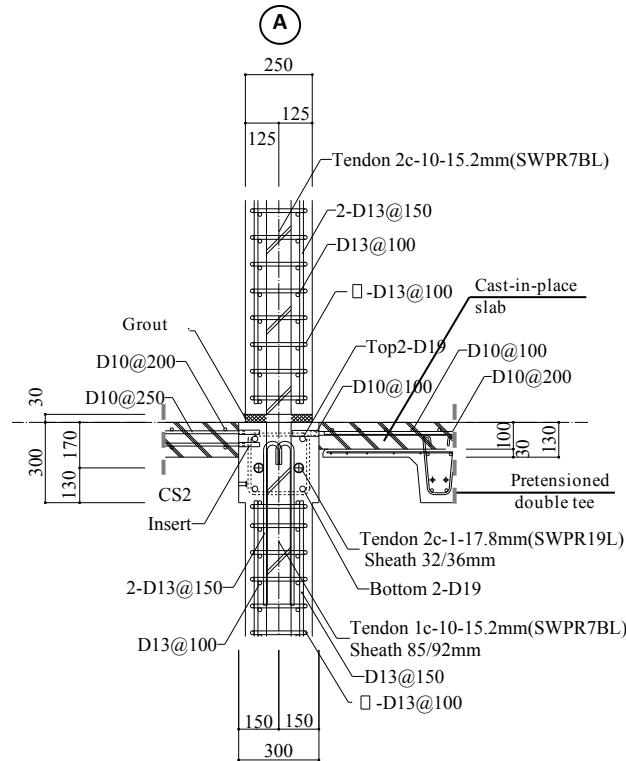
Wall-to-slab connection detail (dimensions in mm) from Nagae et al. 2011
